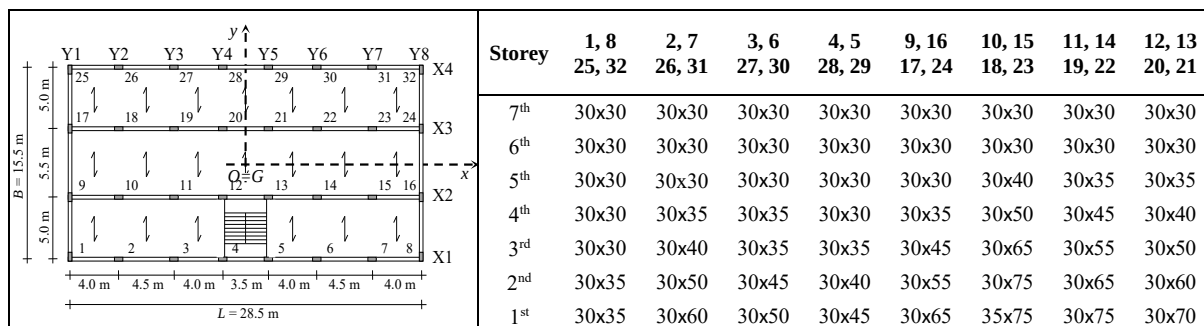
Plan layout of the 7-storey case study building and size of column cross-sections
